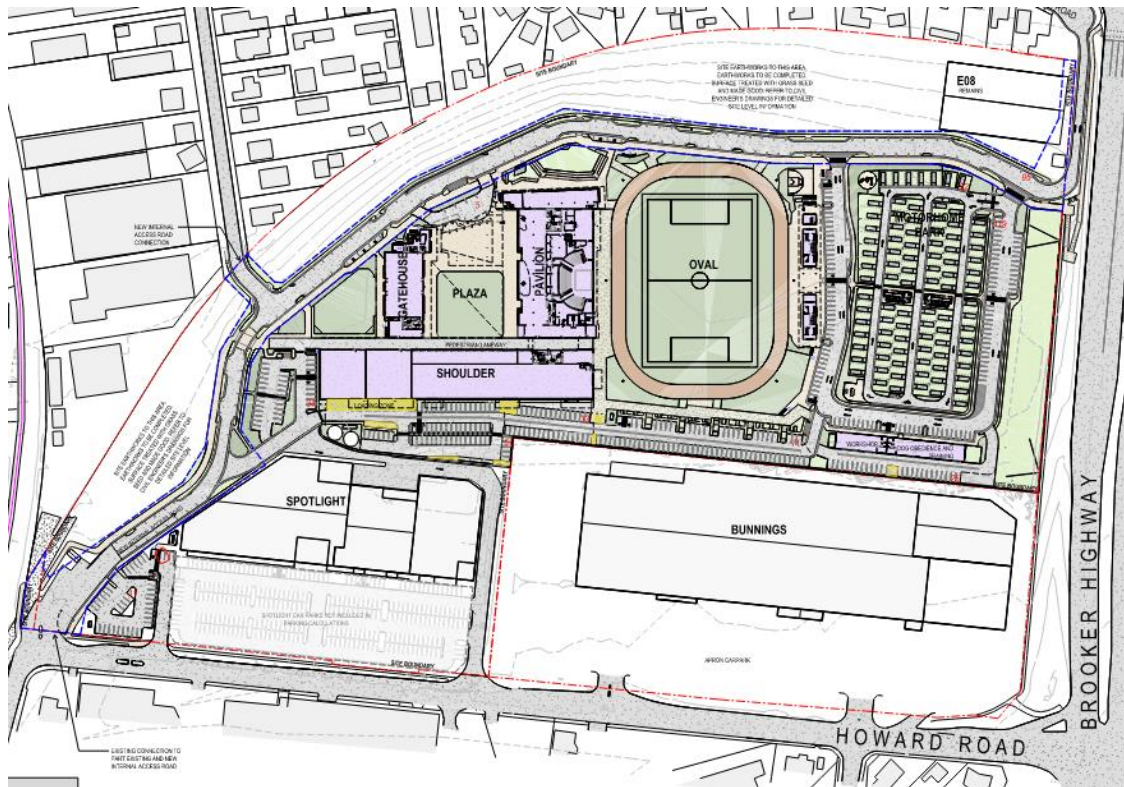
Site plan showing the proposed redevelopment of the showgrounds site
